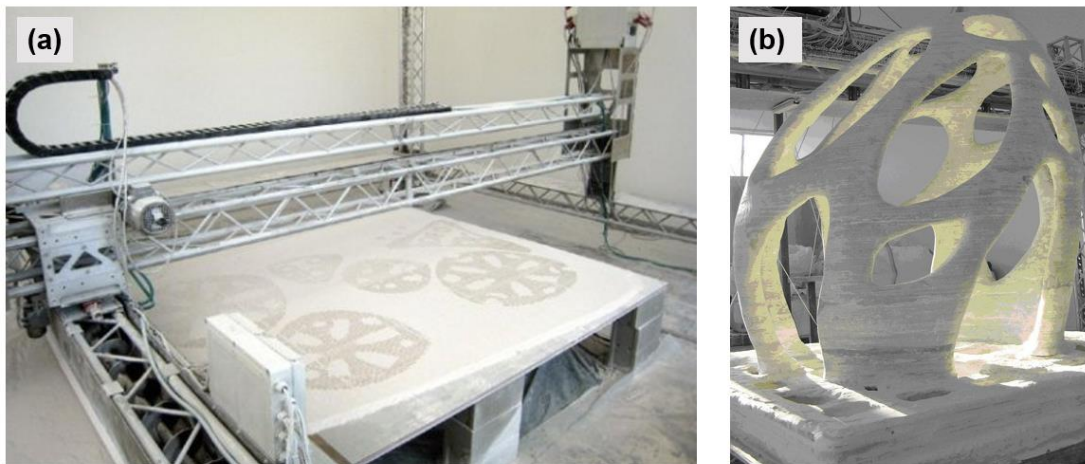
a) D-shape printer and (b) final printed component with all the excess raw material removed [111]
